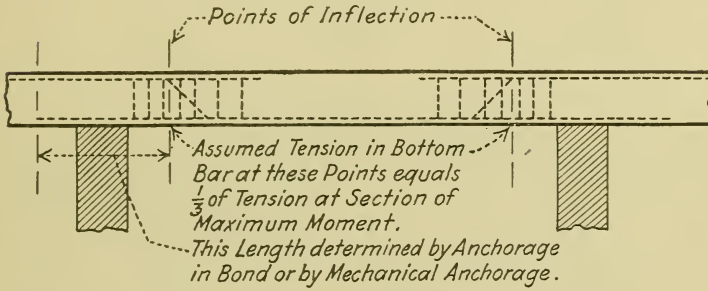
Typical Web Reinforcement for Continuous Beams.
